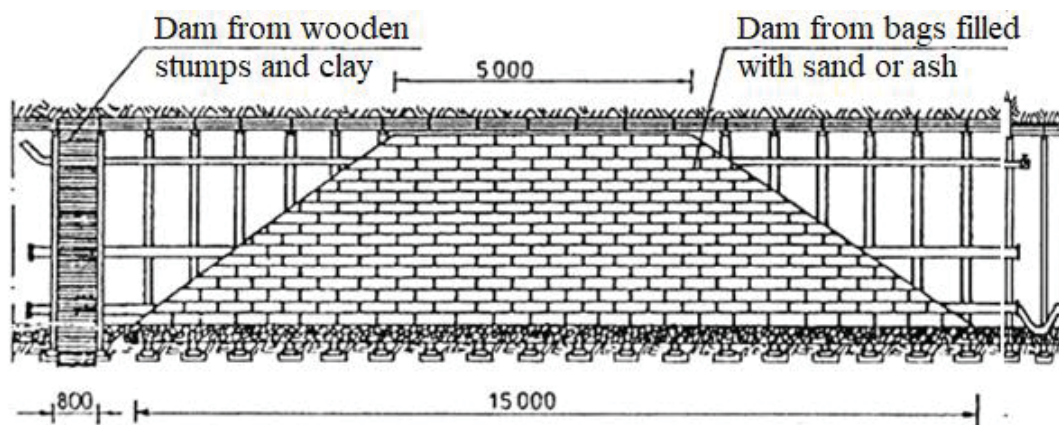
Construction of two kinds of dams (longitudinal section, scale 1:100)
